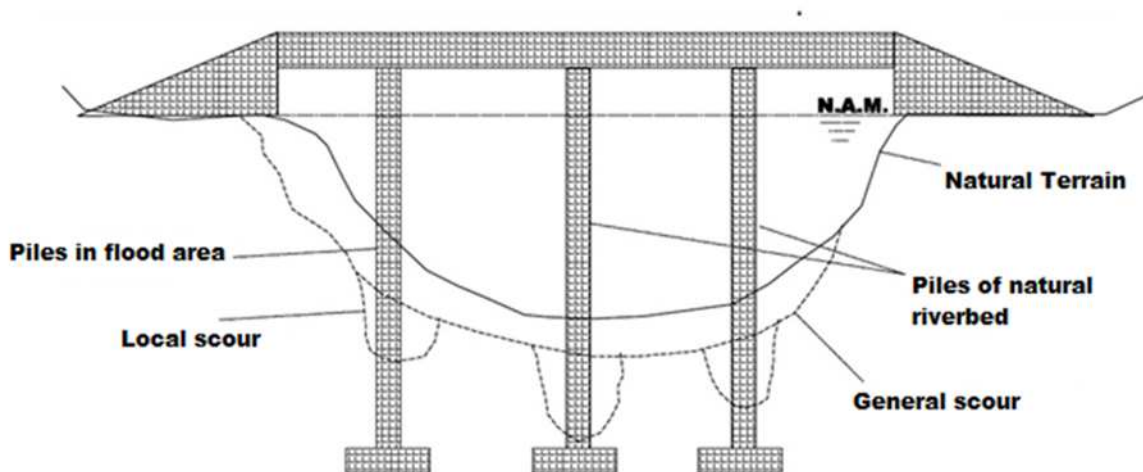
Elevation of foundations of the piles into the main riverbed. (MOP-DACGER)
